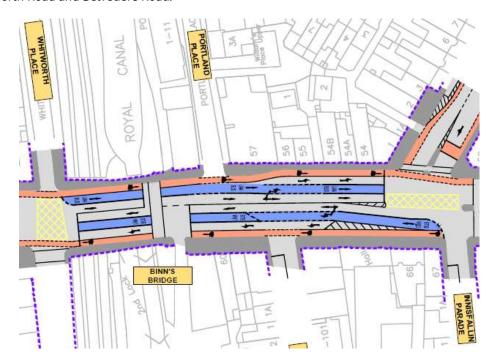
Whitworth Road/Whitworth Place to Belvedere Road/Innisfallen Parade
